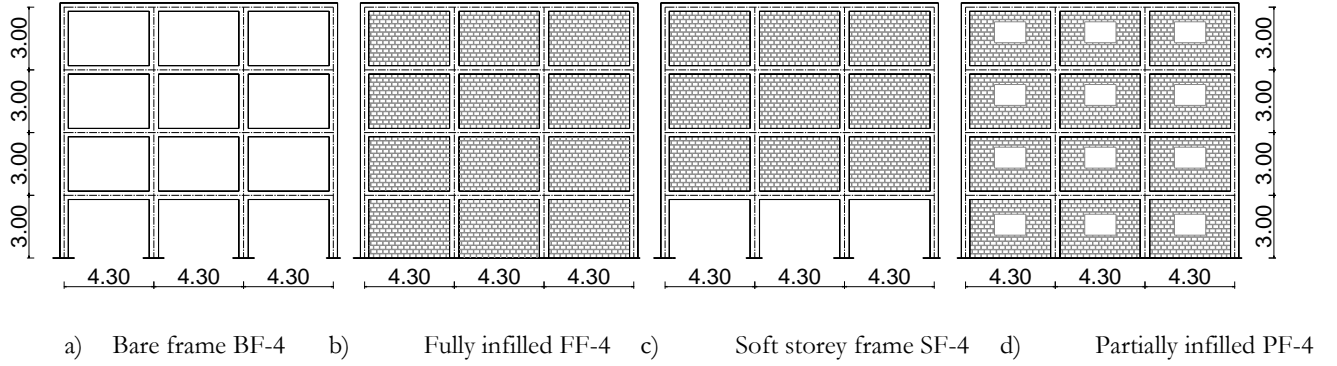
Different frame configurations for the four-storey building (all dimensions in m)
